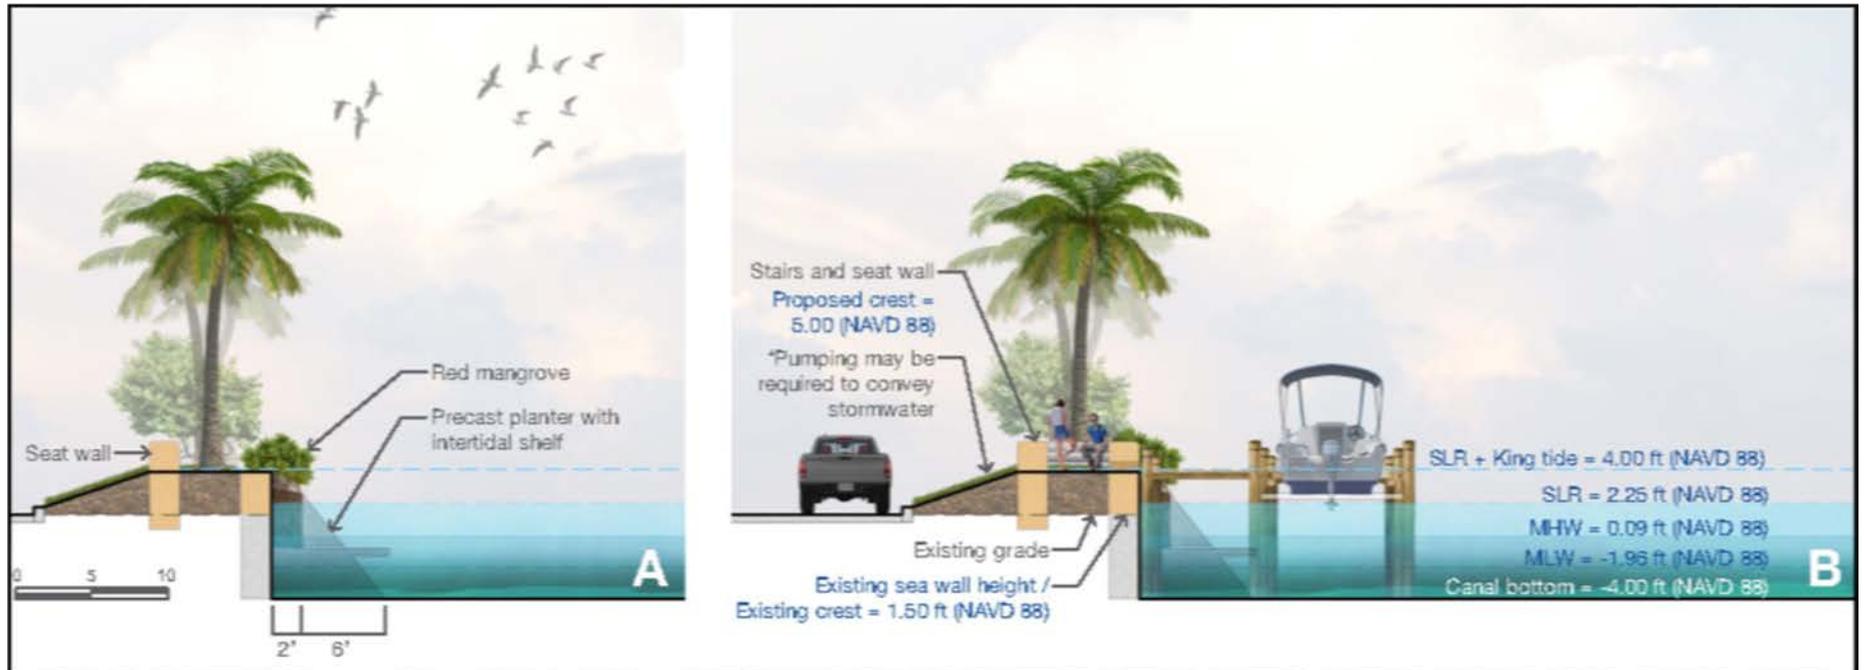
Section View (a) Terraced seat-wall and (b) Stair Access to the boat lift proposed for spatially constrained shallow water/low wake condition seawall enhancements
